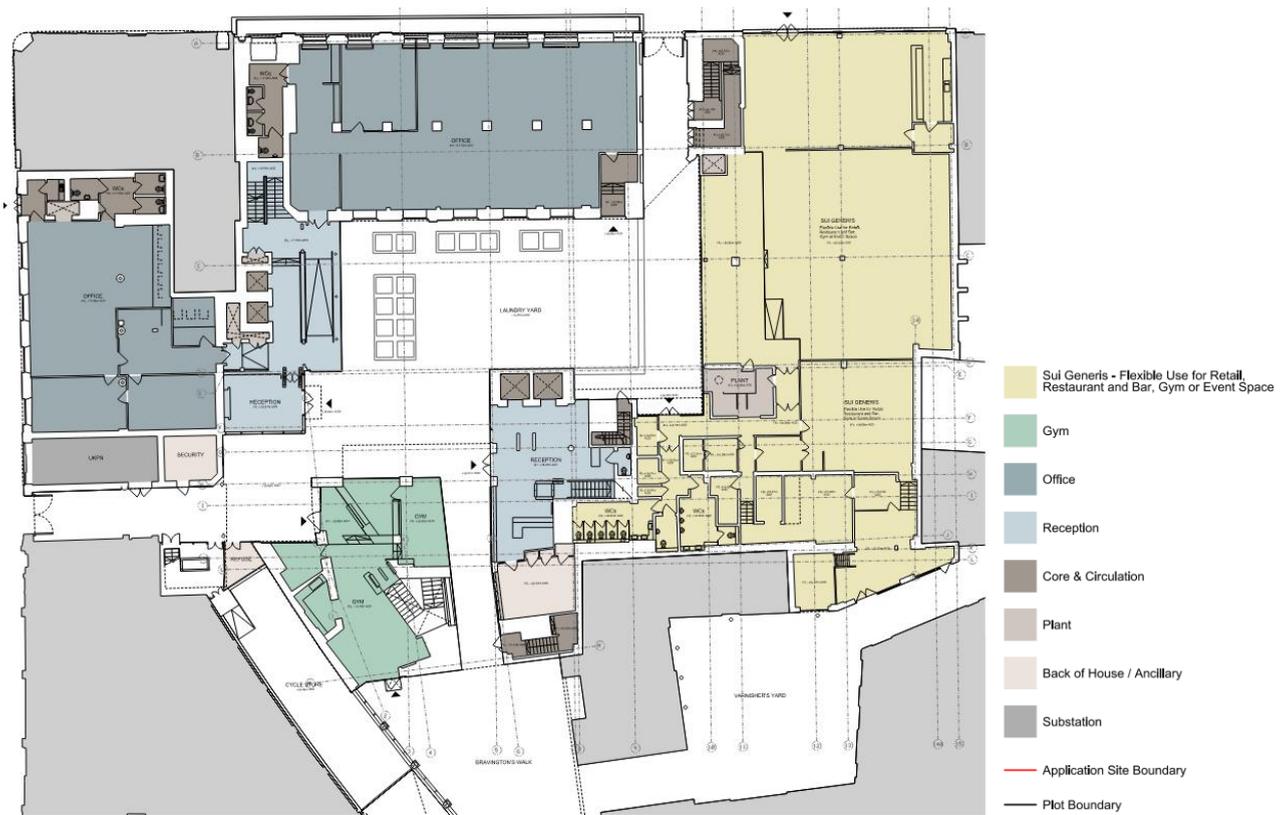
Existing Ground Floor Layout and Uses – Times House and Laundry Building
